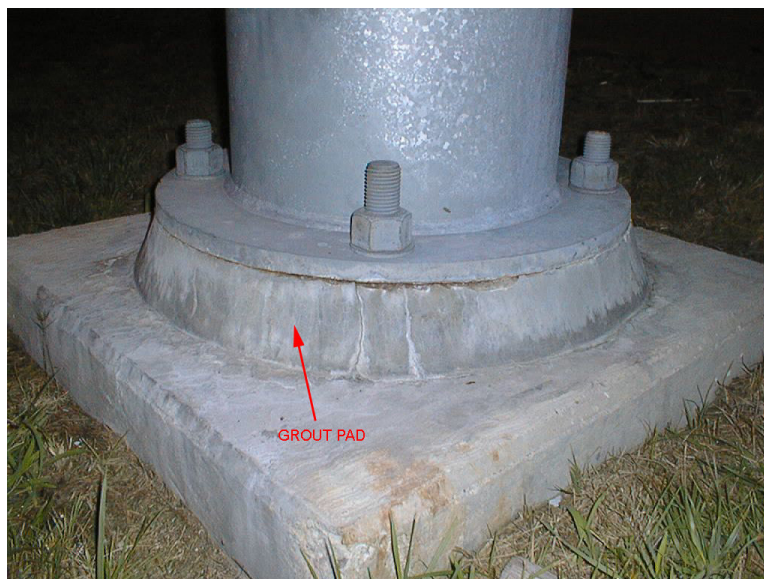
Typical Foundation for a Cantilever Sign Structure
